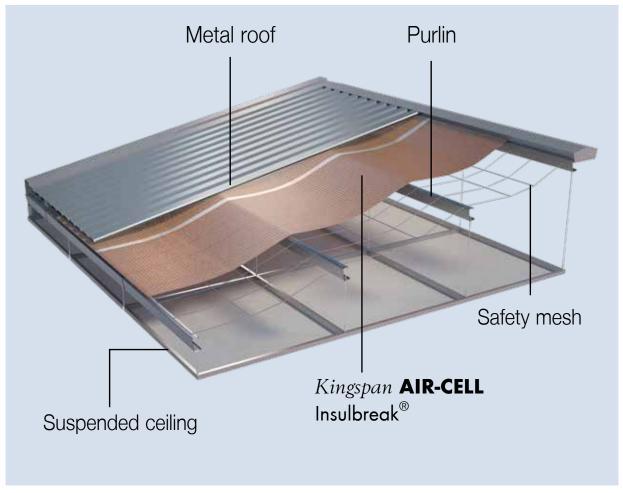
$\it Kingspan$  AIR-CELL Insulbreak® in a commercial office with suspended ceiling installation
